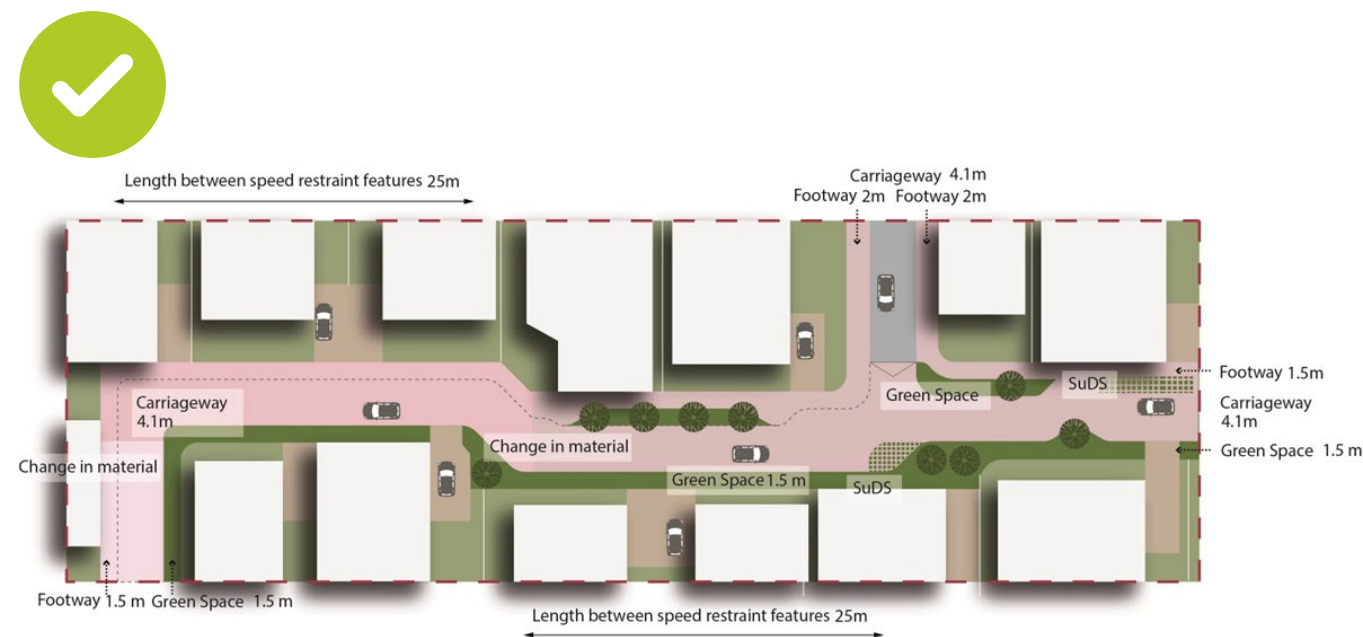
Street Typology Plan for a Residential Link Street in an Urban Context
